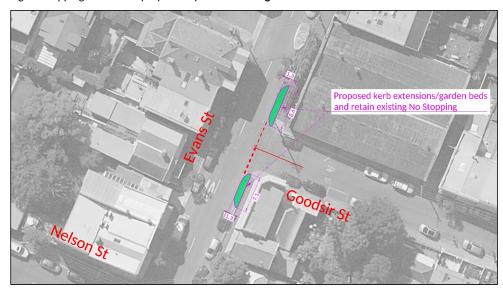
Evans Street / Goodsir Street T-intersection proposal.
